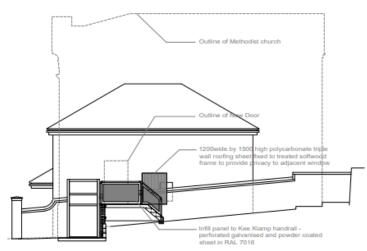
Proposed Side Elevation in Context with Neighbouring Property
